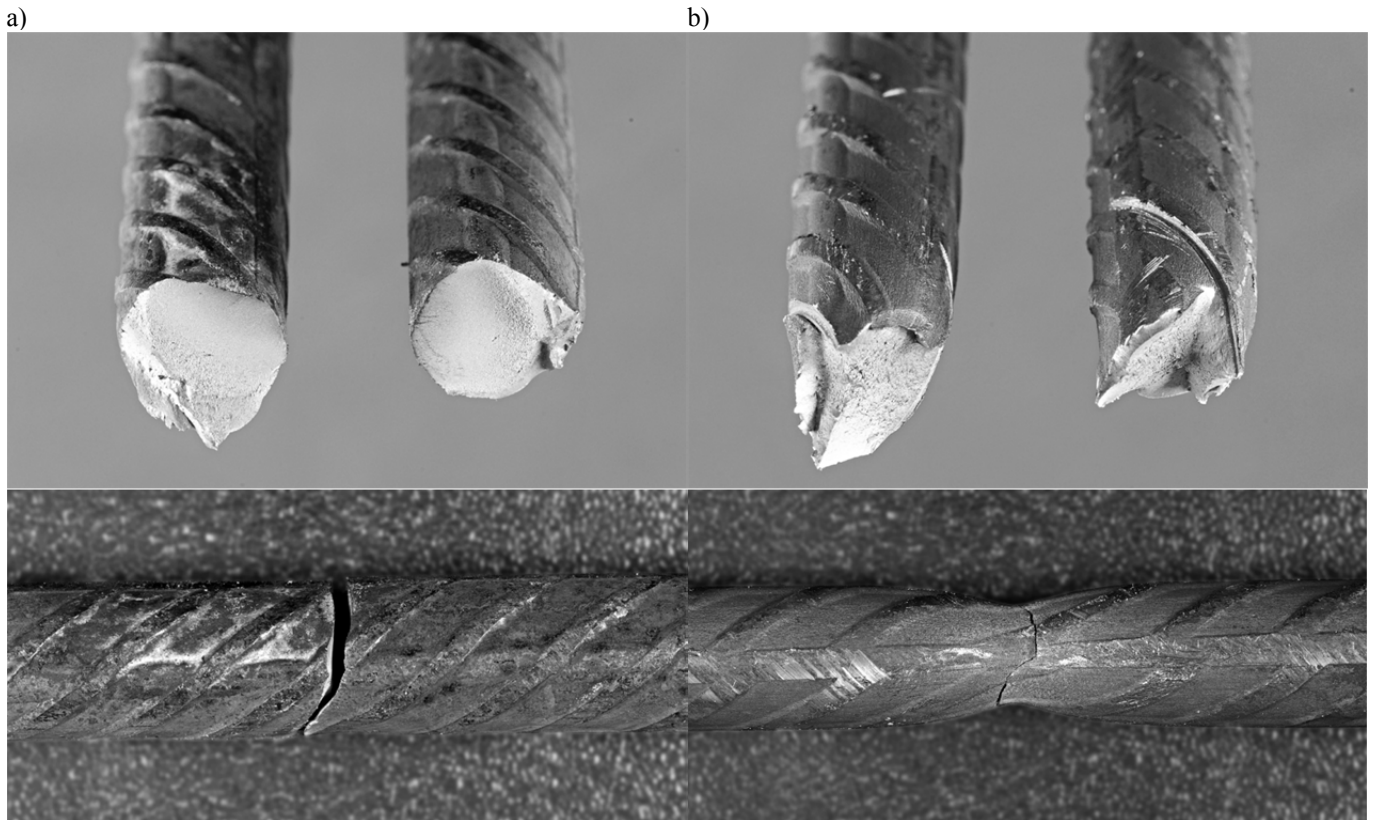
Surfaces and side views of (a) a fatigue and (b) a ductile break.
